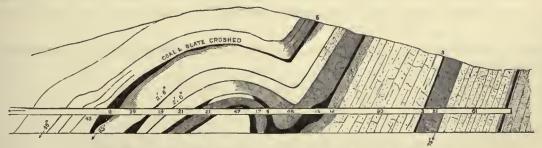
Section of Tunnel in Bare Ridge (Pott and White's).—100 feet = 1 inch.
